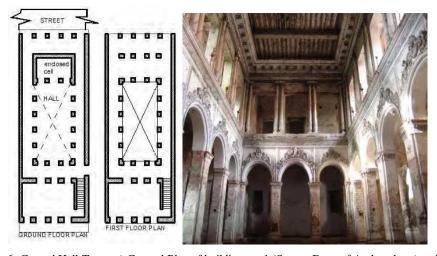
Central Hall Type, a) Ground Plan of building no. 1 (Source Dept of Archaeology) and b) Photographic view
